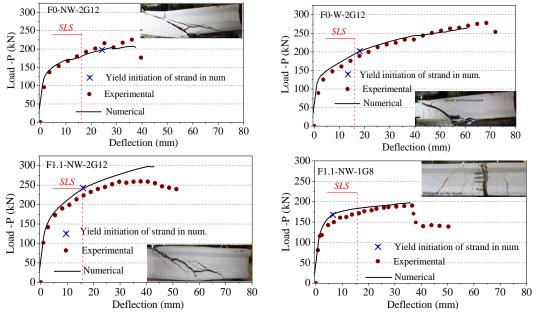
Deflection and crack pattern (at failure stage) of the beam specimens.
